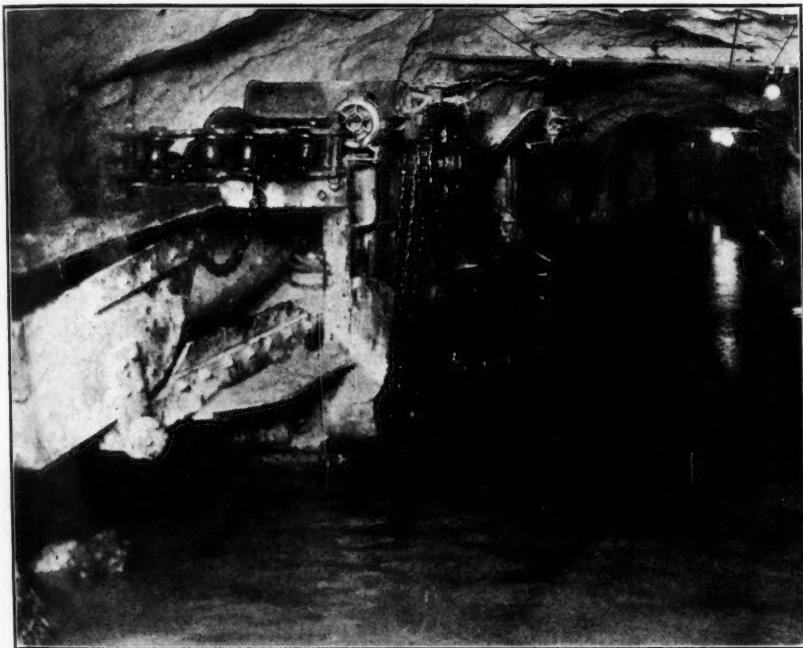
MOFFAT TUNNEL, EAST PORTAL, SHOWING CONWAY MUCKER IN WATER TUNNEL DURING FLOOD.
